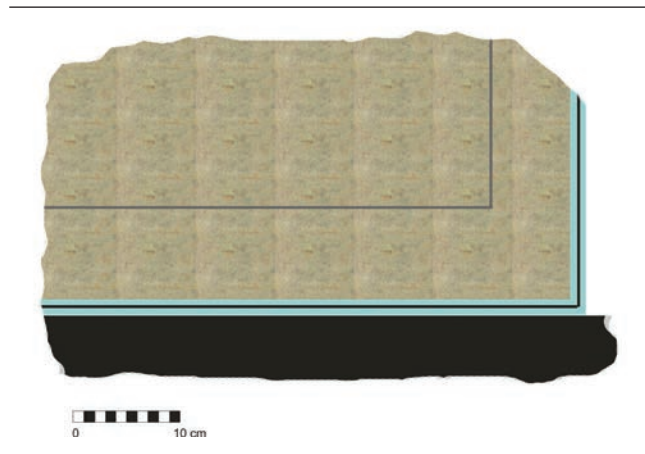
A conceptual reconstruction of the floor and walls in the central room (reconstruction and drawings by: Đ. Gobić-Bravar).
